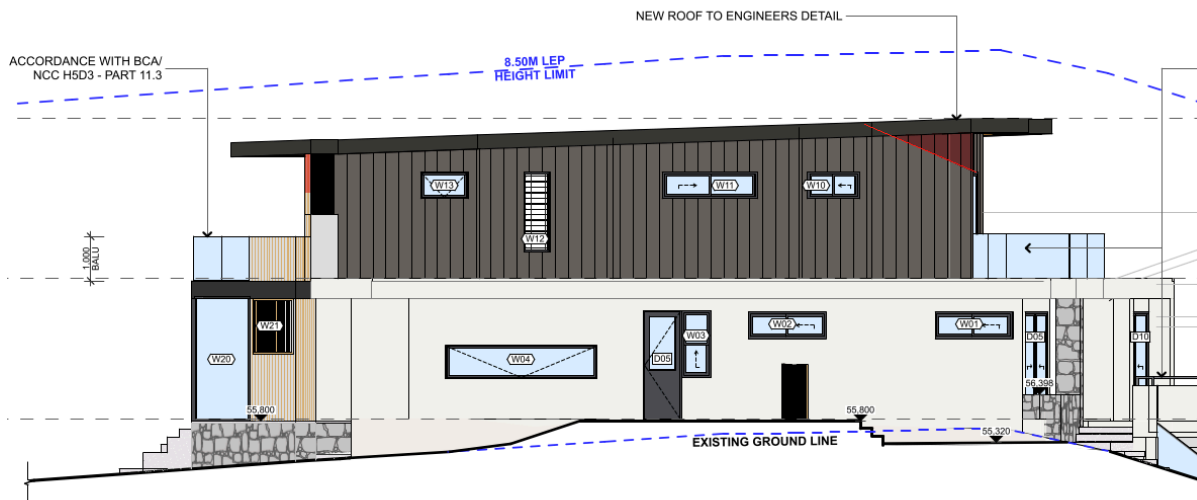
Envelope breach to the "northern elevation" adjoining No. 16 Hillcrest Avenue.
